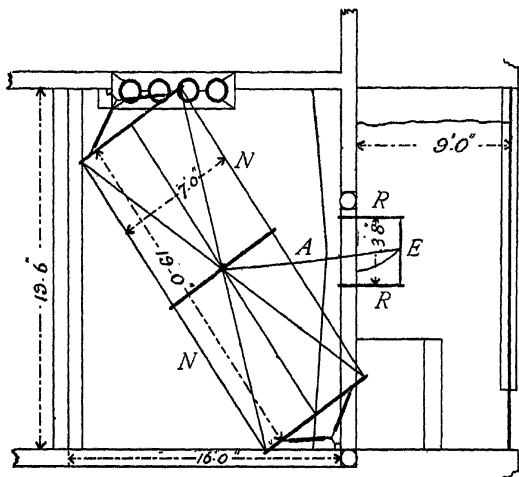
Plan showing Main Dimensions of Wireless Telegraph Station at Hampstead.
